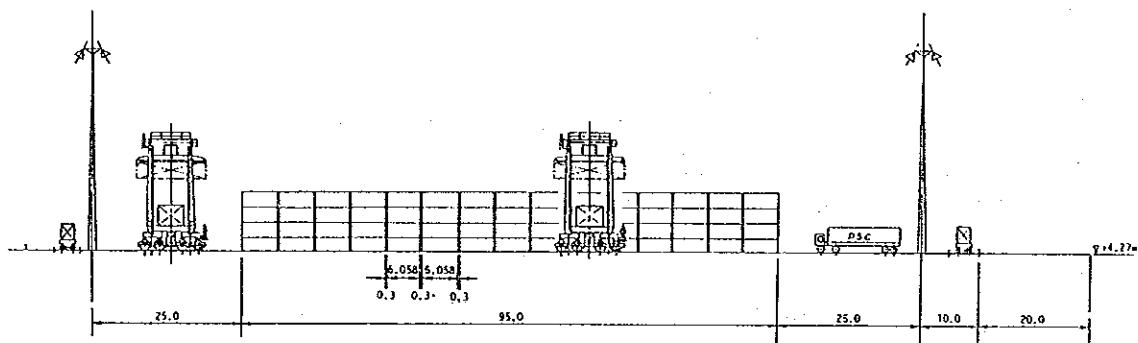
A Cross Section of No.3 Container Berth (Unit: m)
